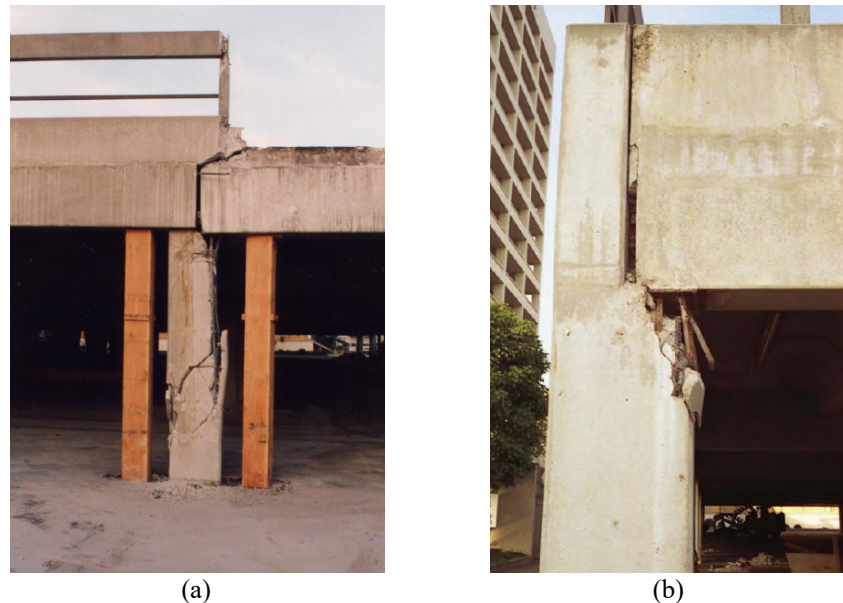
“(a) Beam-to-column connection failure and shear failure of column in precast concrete parking structure (1994 Northridge Earthquake); (b) brittle failure of beam-column pin connection at top of corner column (1994 Northridge Earthquake)” (FIB 27, 2003).
